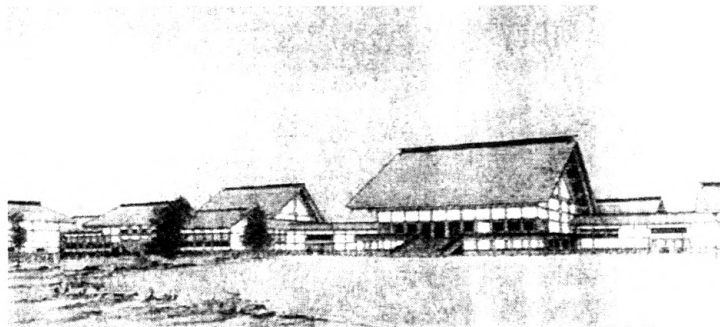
The elevation of Japanese Cultural Center in Bangkok.
